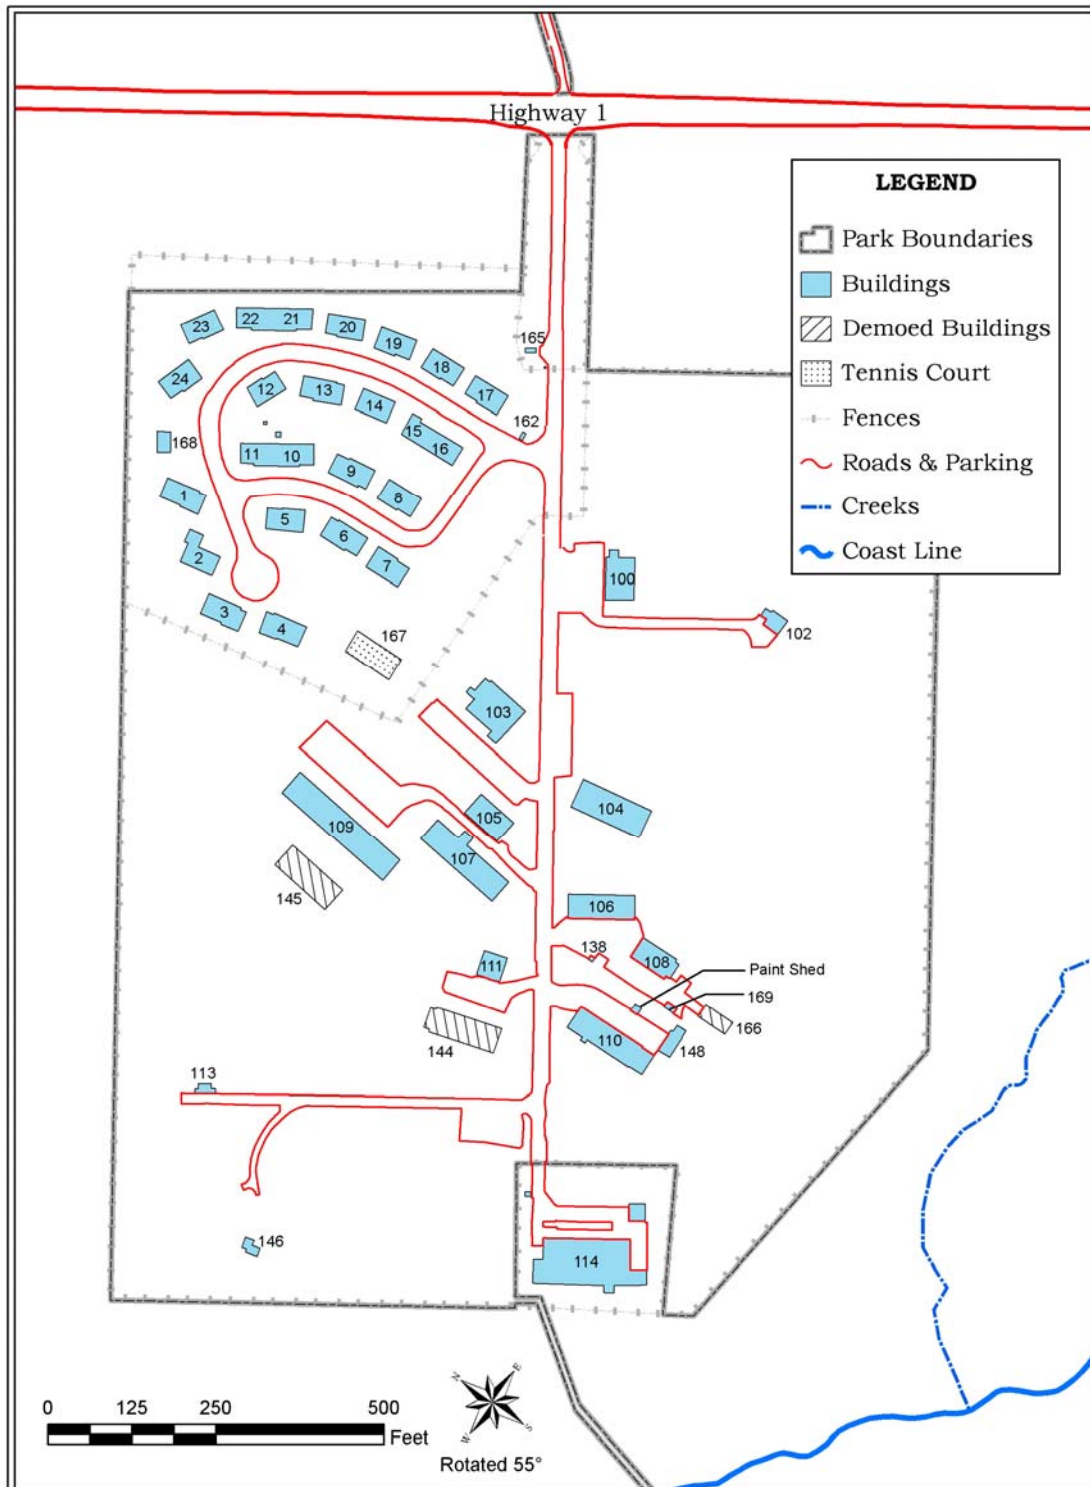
NAVFAC site plan (Courtesy: State of California, Department of Parks and Recreation, 2013)
